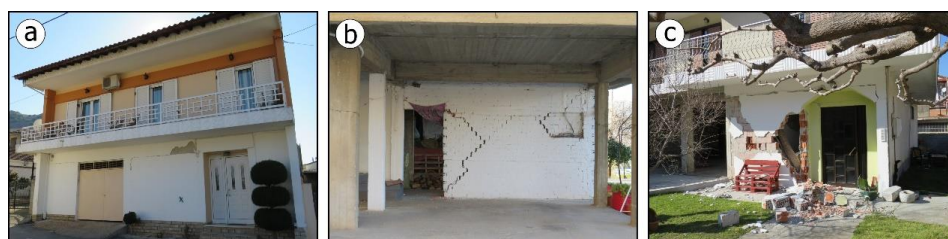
Few earthquake-affected reinforced concrete buildings suffered non-structural damage varying from slight detachment of the infill walls from the surrounding reinforced concrete frame (a) and cracking in the infill walls (b) to partial collapse of the infill walls (c).
